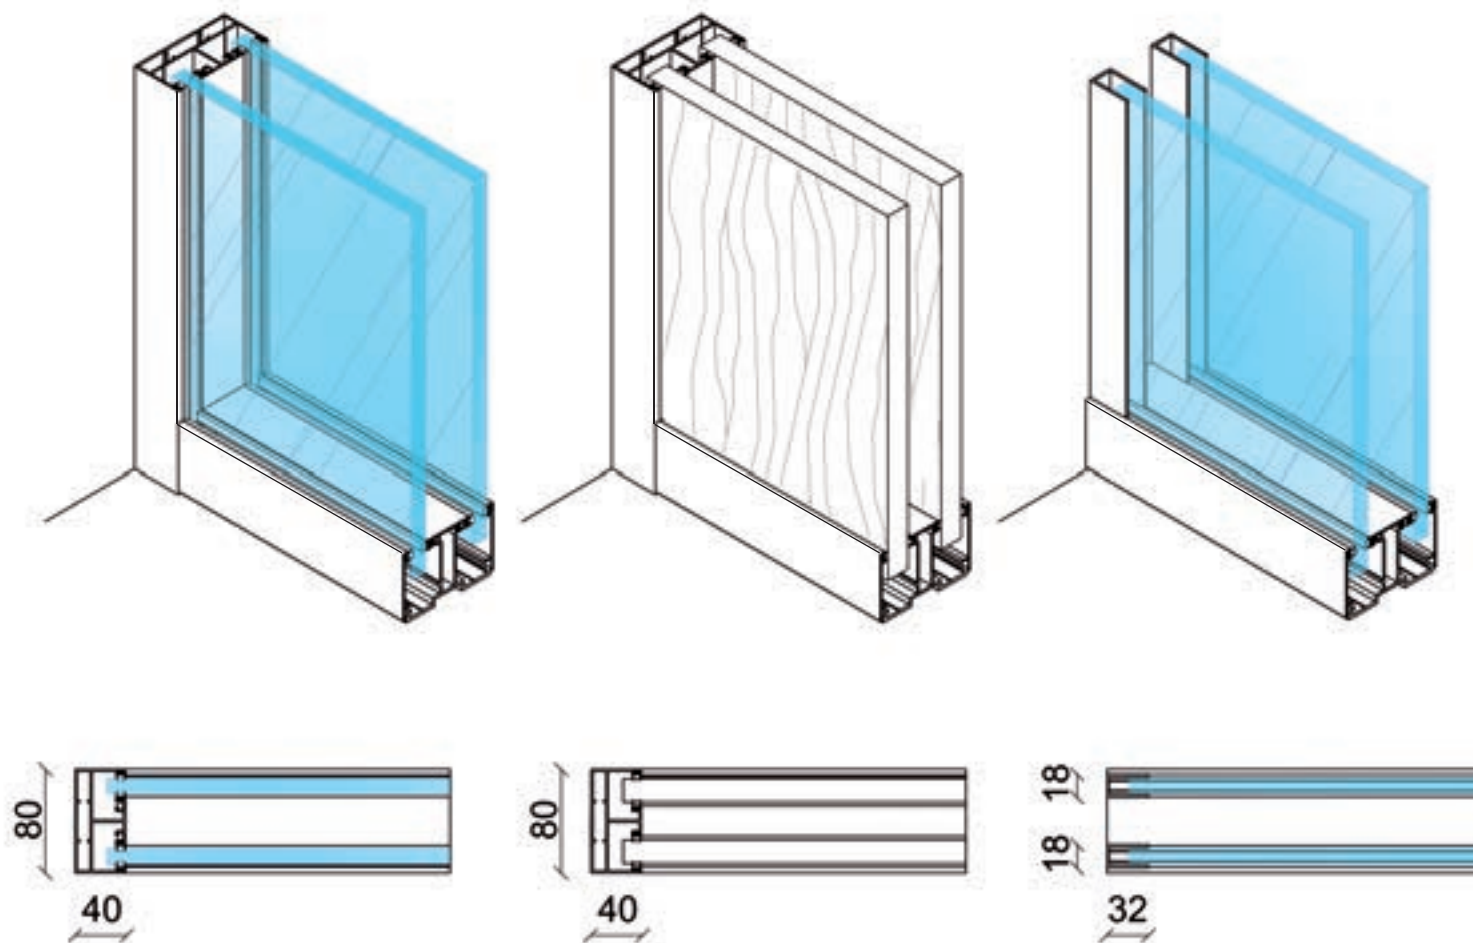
DETAILS STARTING PROFILES / DETAILÉ PROFILE DE DÉPART / ANFANGSPROFIL DETAIL
